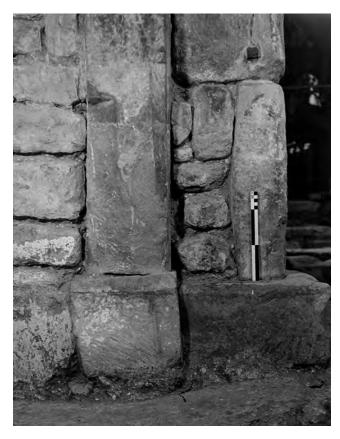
Tower: Stage 1A. Detail of the base of the northflanking pilaster-strip of the eastern arch. Note the original bolster finish on the base-block and survival of a band of primary wallplaster above floor level. Scale of 25 cm. Photo: Warwick Rodwell
